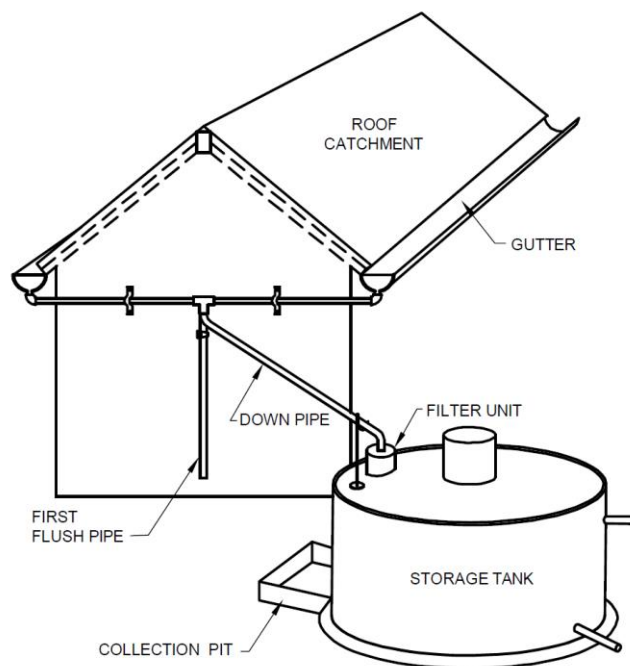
A TYPICAL ROOF WATER HARVESTING SYSTEM
